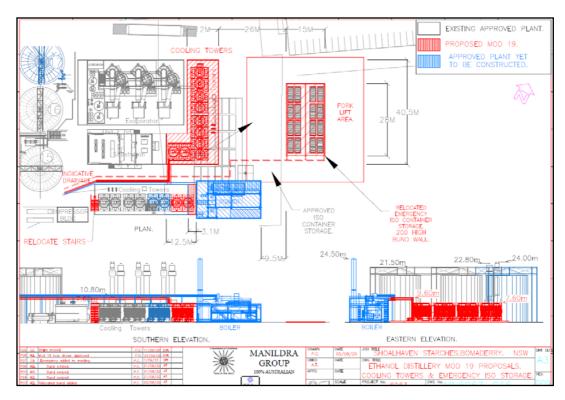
Plan of proposed additional cooling towers and relocation of approved ISO container storage area.
